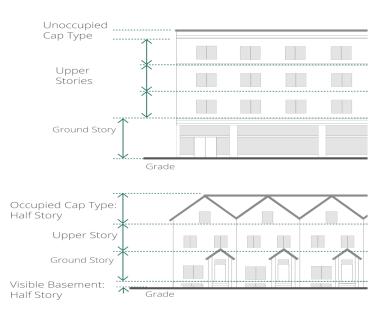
Measuring Stories with Floor-to-Floor Height
